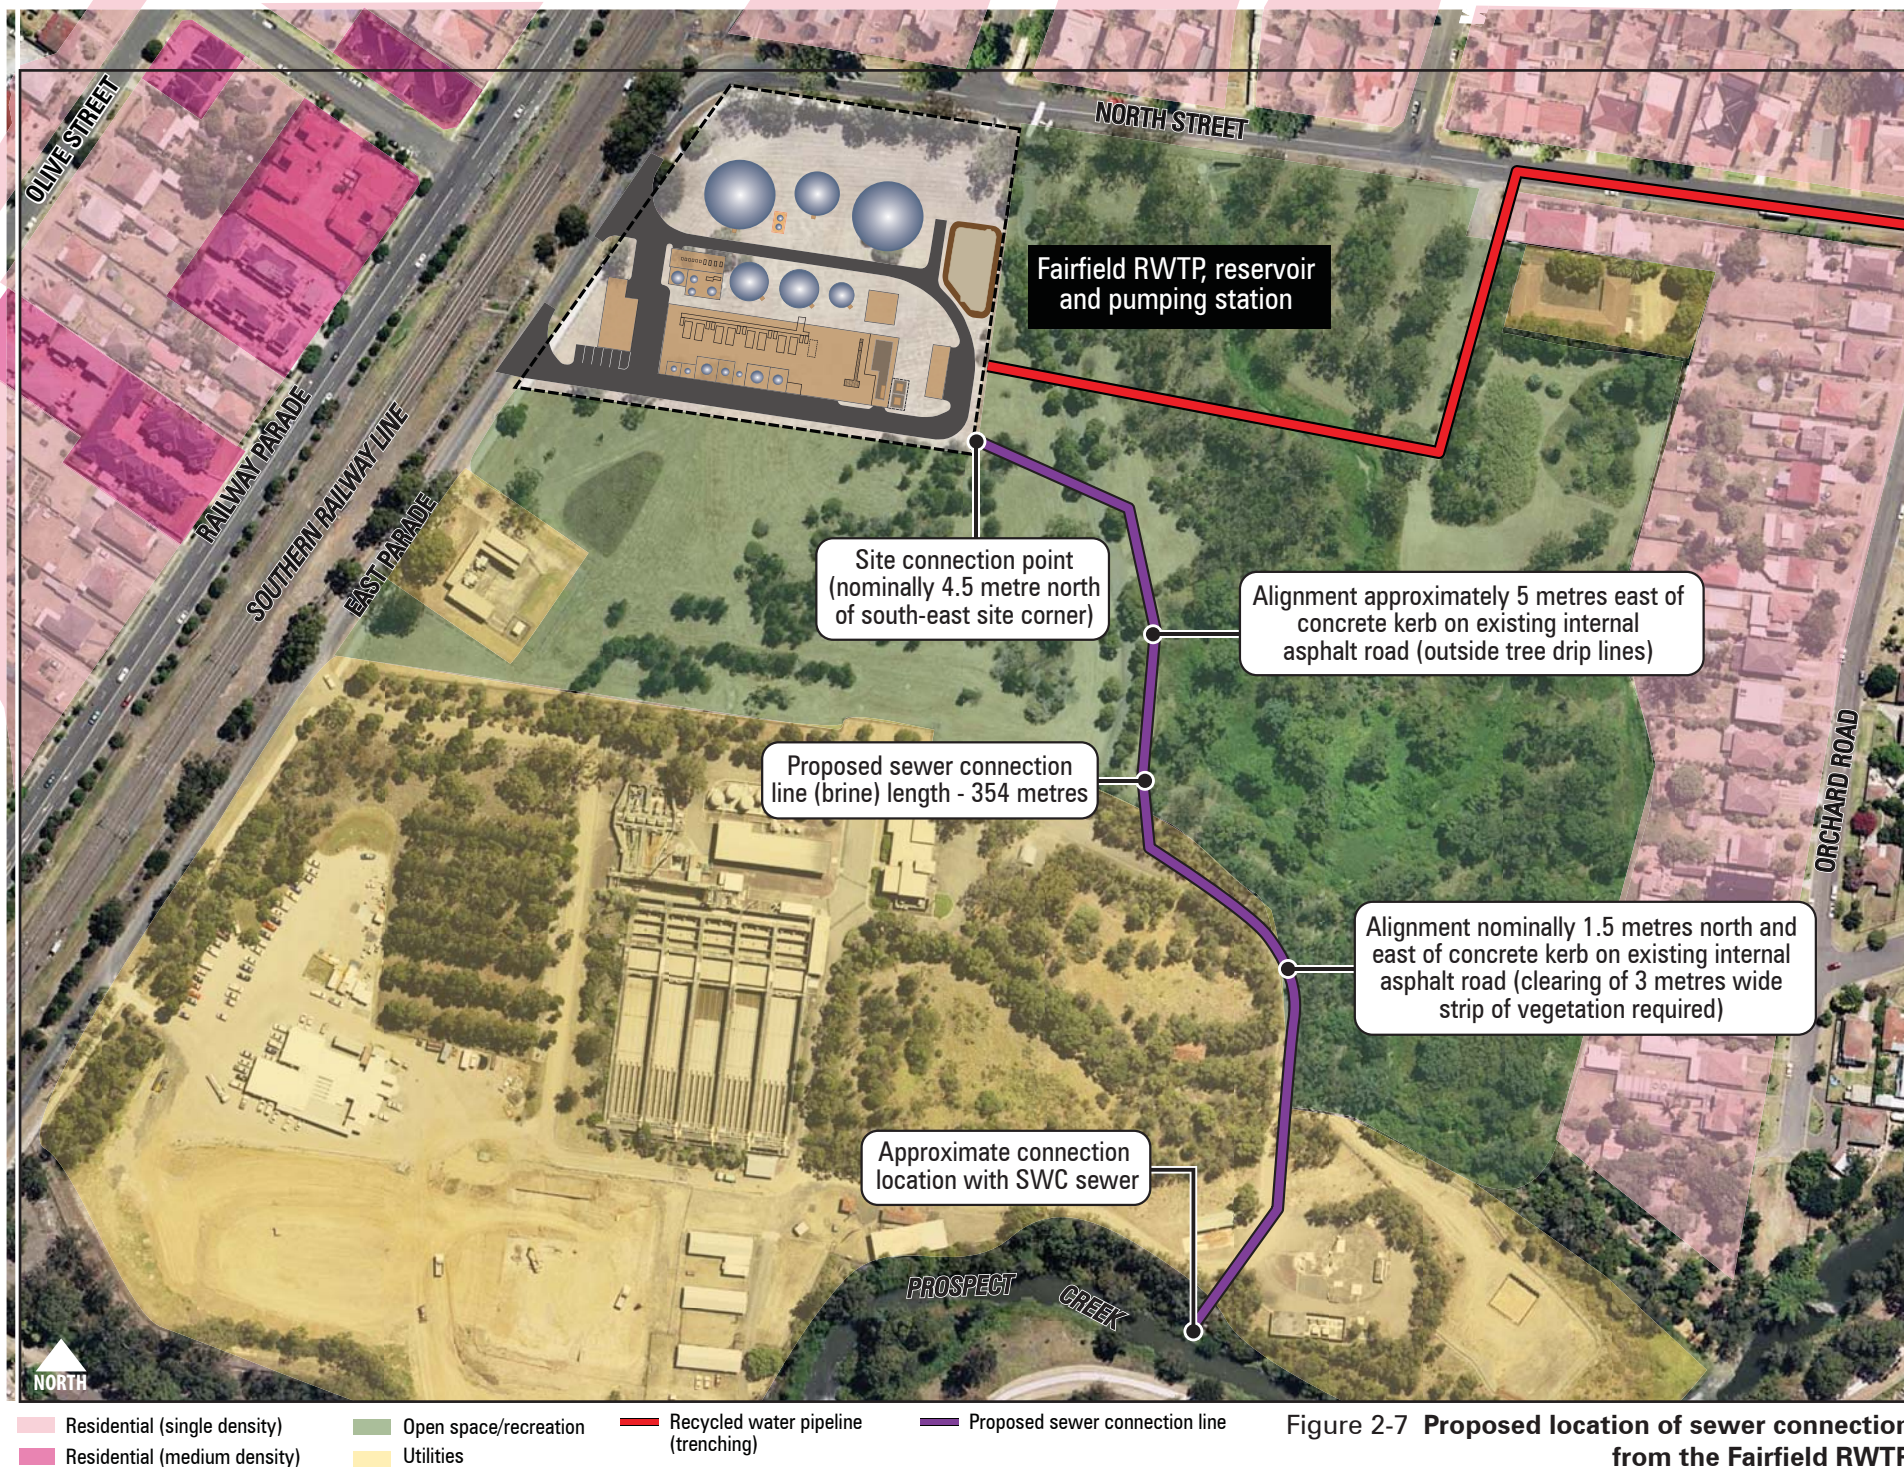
Proposed location of sewer connection from the Fairfield RWTP
